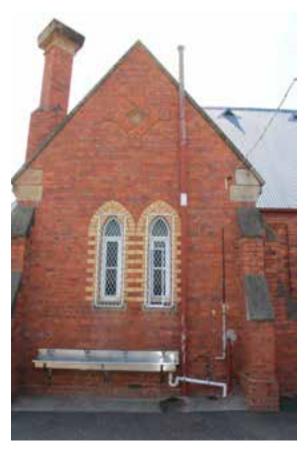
At the rear of the west elevation is a vestry (1893) with a parapeted gable, large chimney (the top half angled) with a wide rendered cap. The west side of the vestry has an
